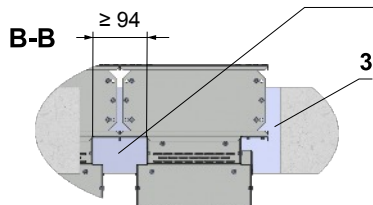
Solid ceiling construction - battery - mortar or gypsum
